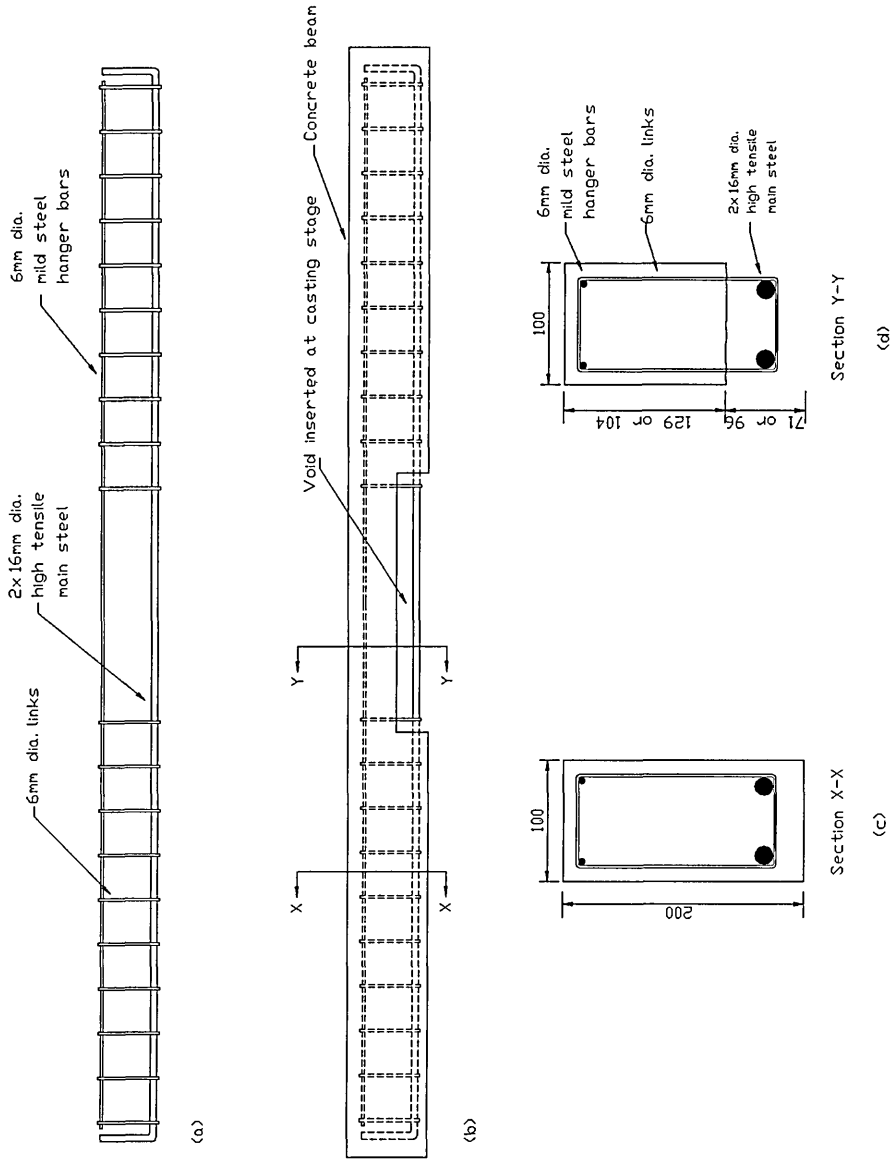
Reinforcement details of repaired beams: (a) steel fabricated and (b) reinforced concrete beam (c) and (d) sections through reinforced concrete beam
